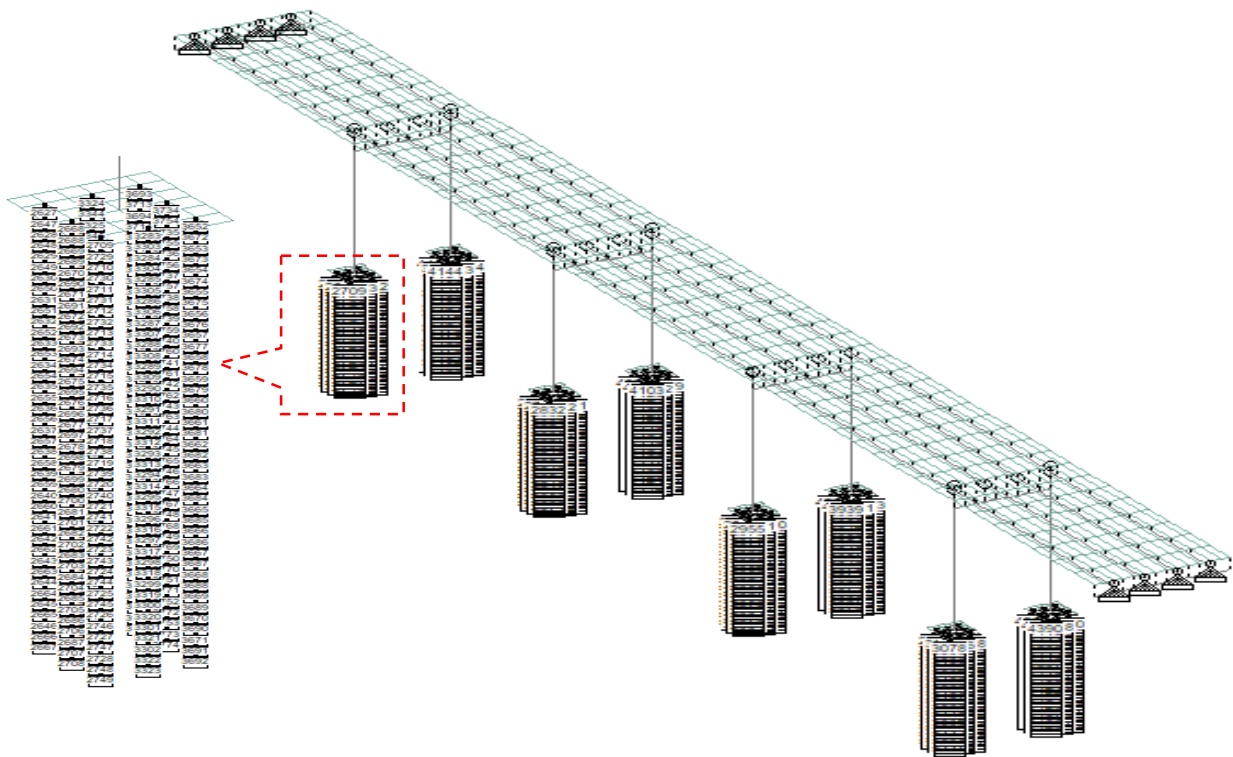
Typical model of the bridge superstructure and foundation in STAAD.Pro
